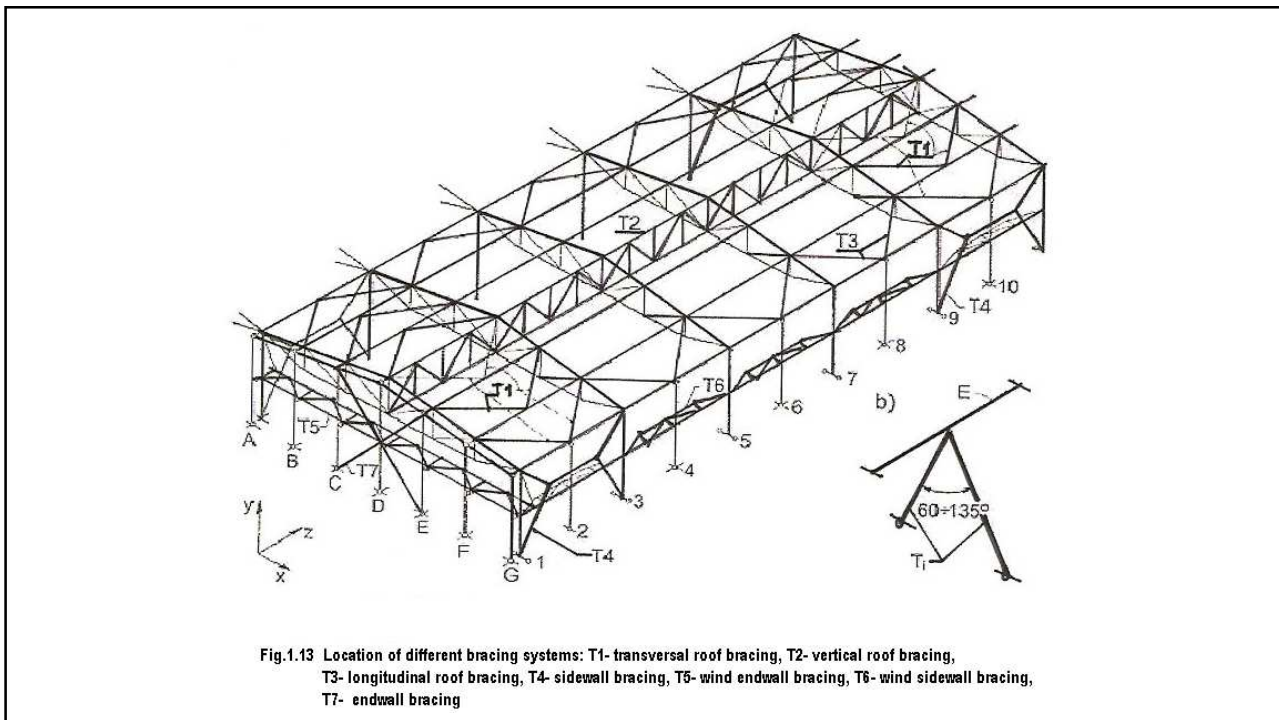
Location of different bracing systems: T1- transversal roof bracing, T2- vertical roof bracing, T3- longitudinal roof bracing, T4- sidewall bracing, T5- wind endwall bracing, T6- wind sidewall bracing, T7- endwall bracing
